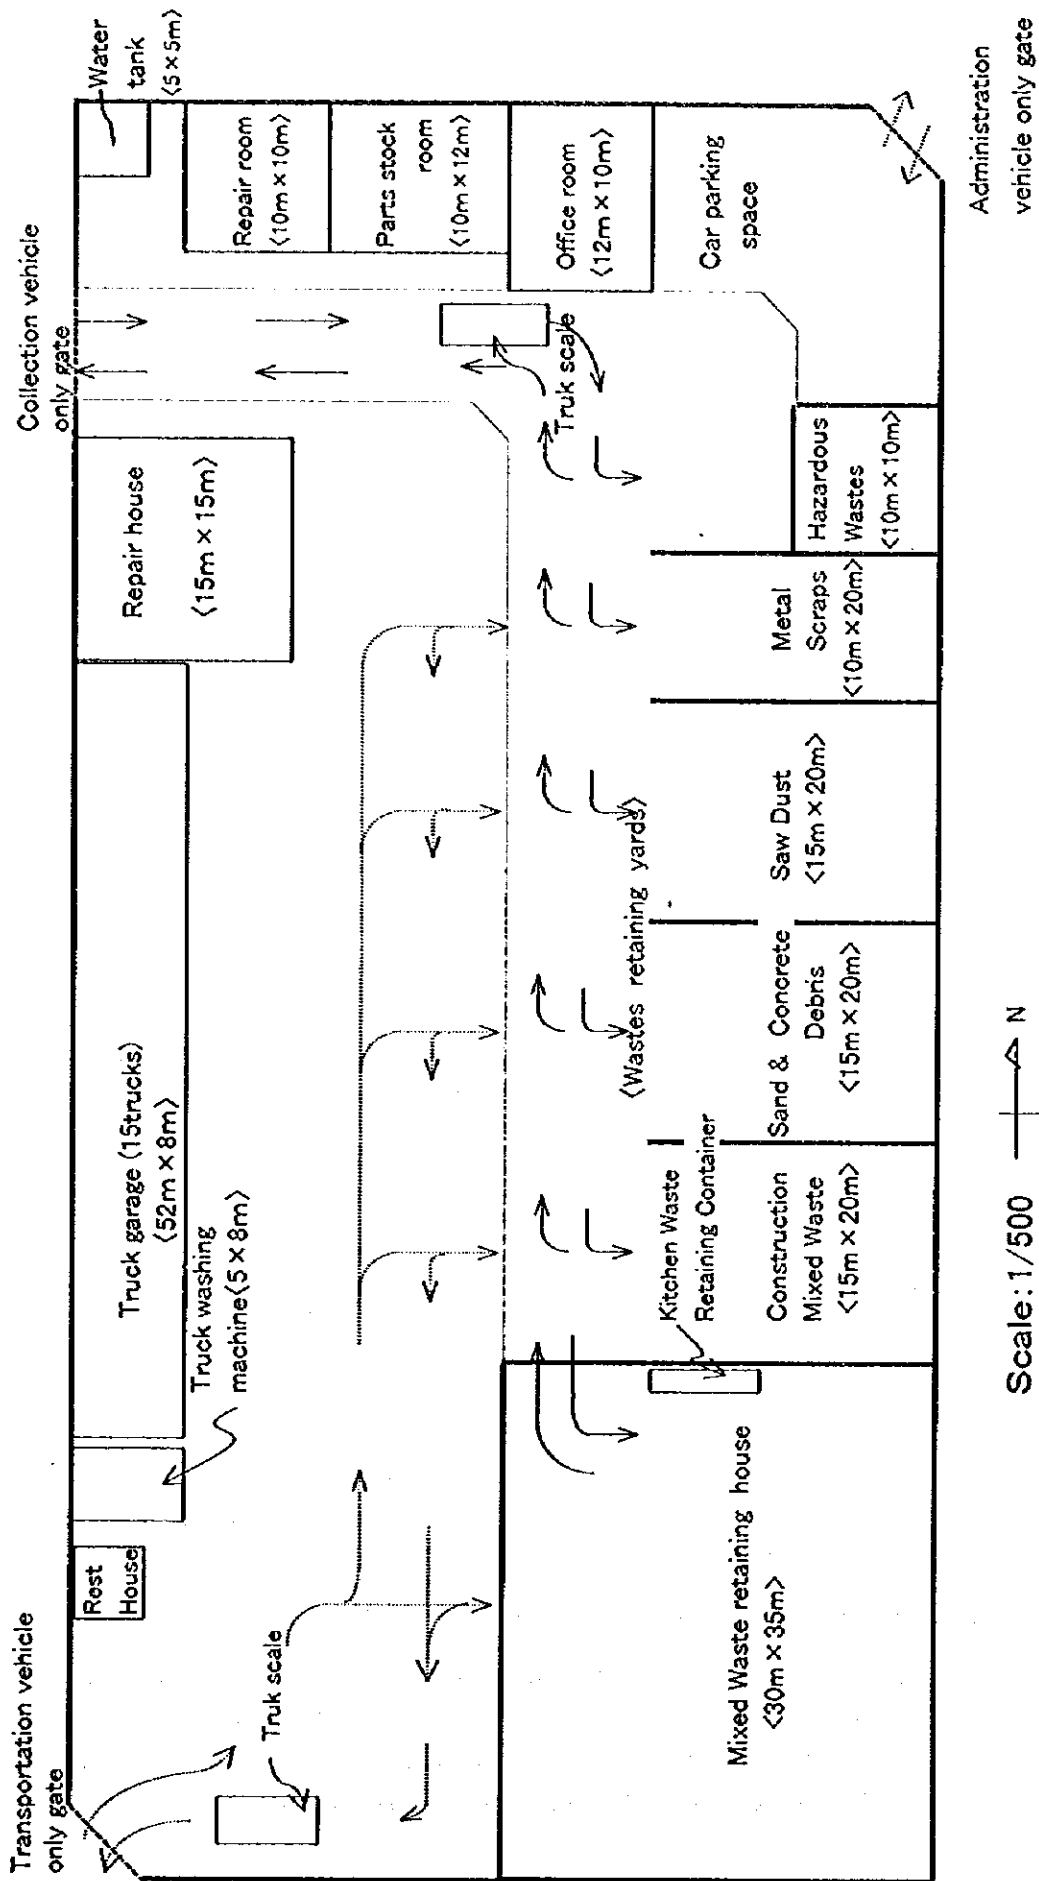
Transfer Station Plan (200 feet x 400 feet)
